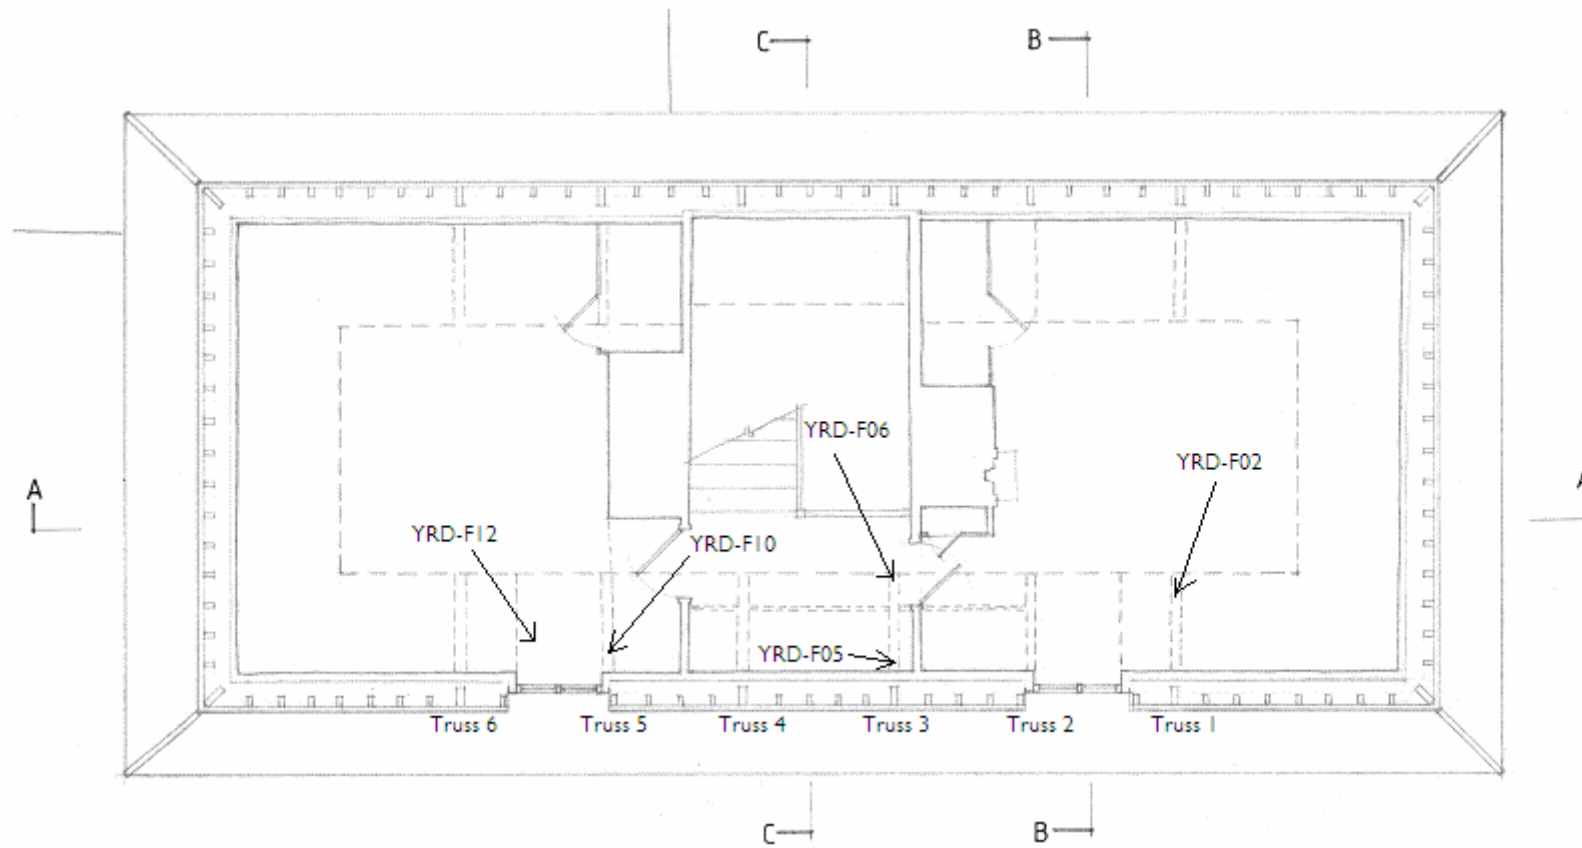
Yarde Farmhouse; South range, second floor plan, showing truss position and the location of samples YRD-F02, YRD-F05-06, YRD-F10, and YRD-F12 (Architecton)
